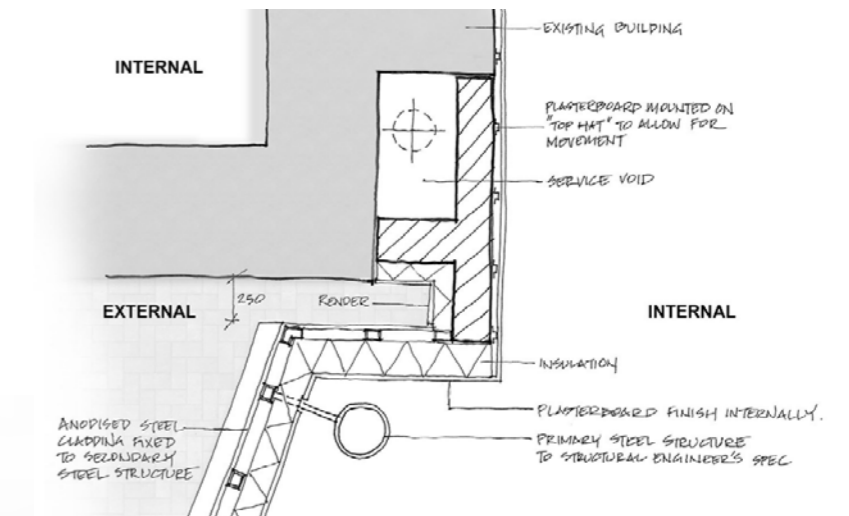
Indicative plan detail: Junction of existing building and new extension (not to scale)
